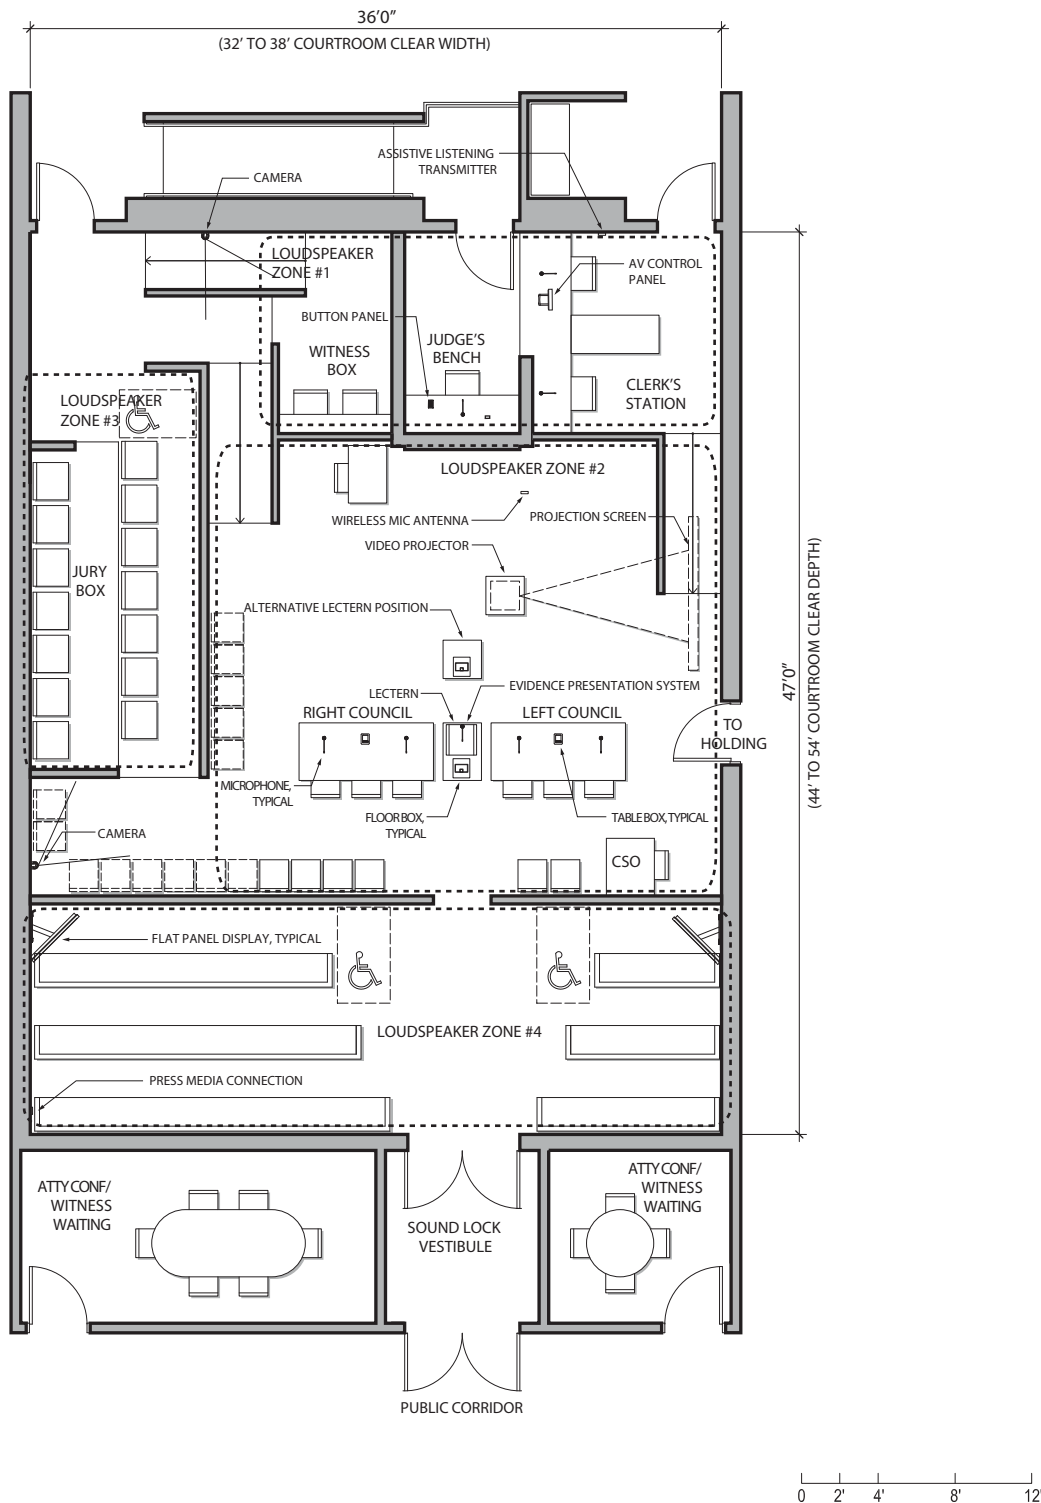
Typical Courtroom, Center Bench—A/V Requirement
